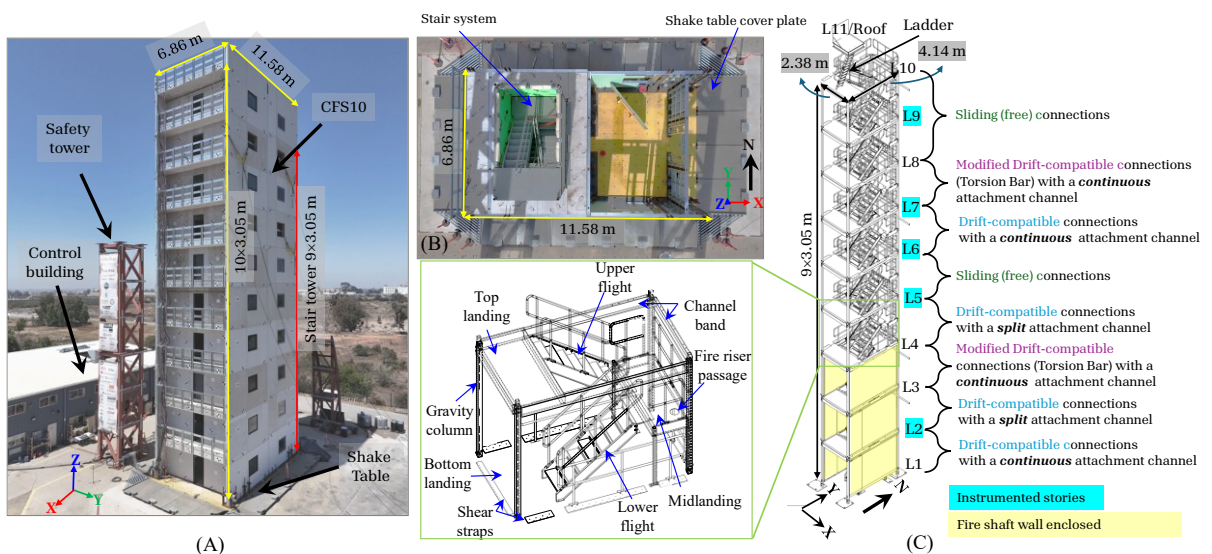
(A) CFS10 building isometric view, (B) CFS10 building plan view, and (C) stair tower isometric view (various connection types are color-coded)
